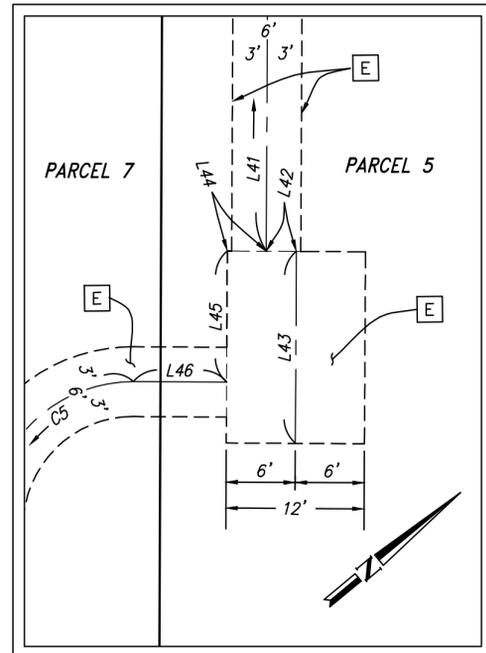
DETAIL "D" (SEE SHEETS 3, 4 AND 5)
